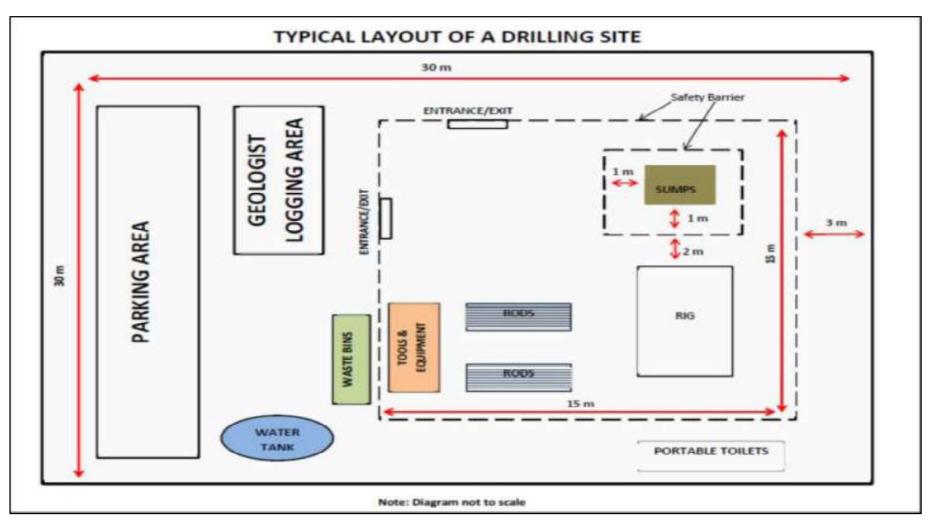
TYPICAL DRILLING ACTIVITY LAYOUT
